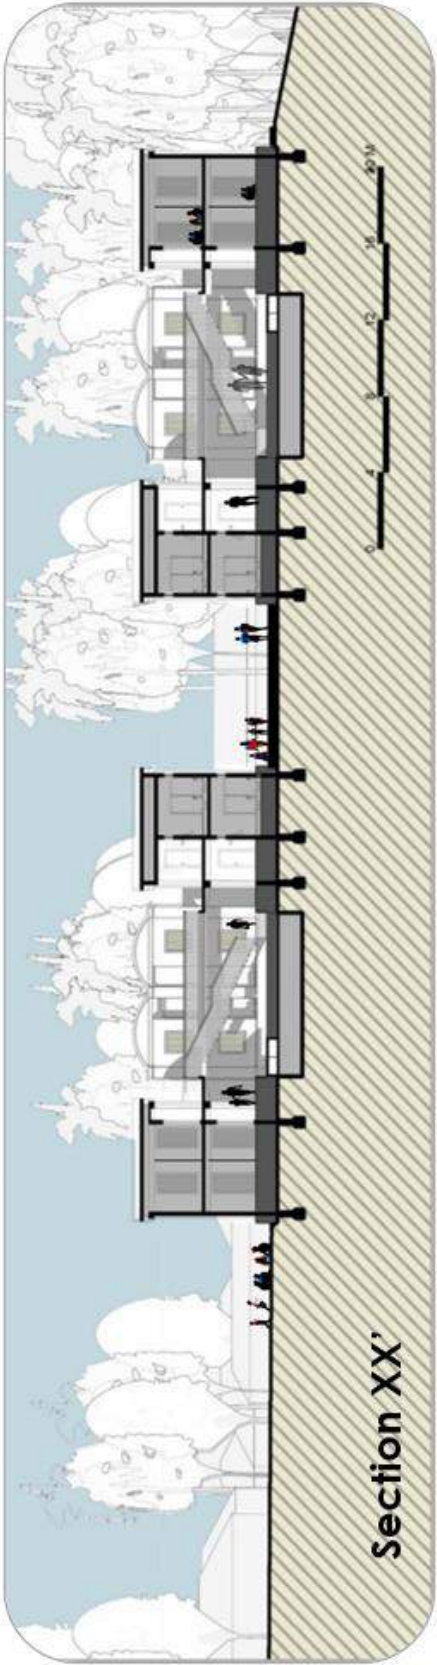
Elevation and Section of Mass Housing for Transient Fishermen (Source: Author)
